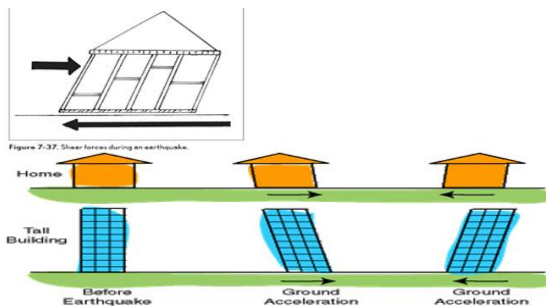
Individual Building And Multi Storey Building Subjected To Shear Force
